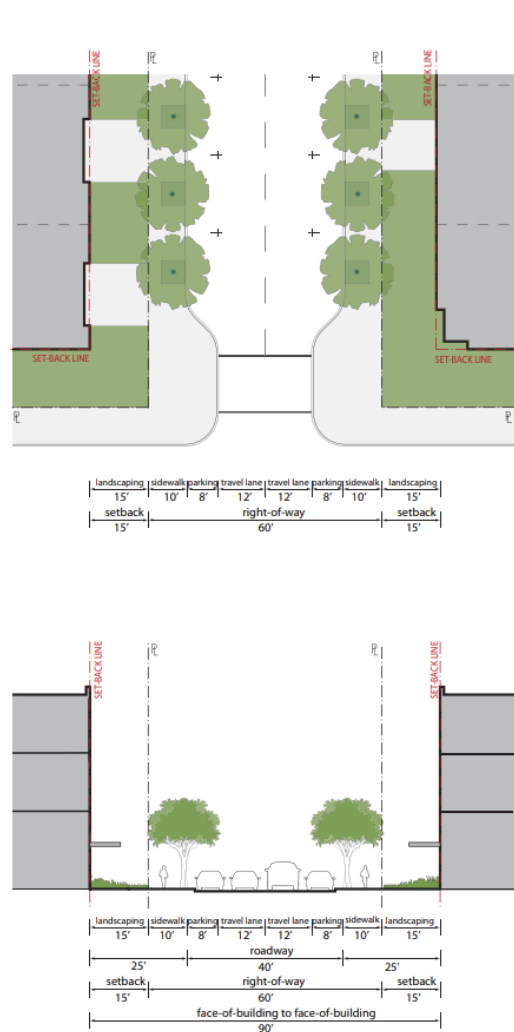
Proposed Cross Section for Slow Street (North San José Area Design Guidelines)
